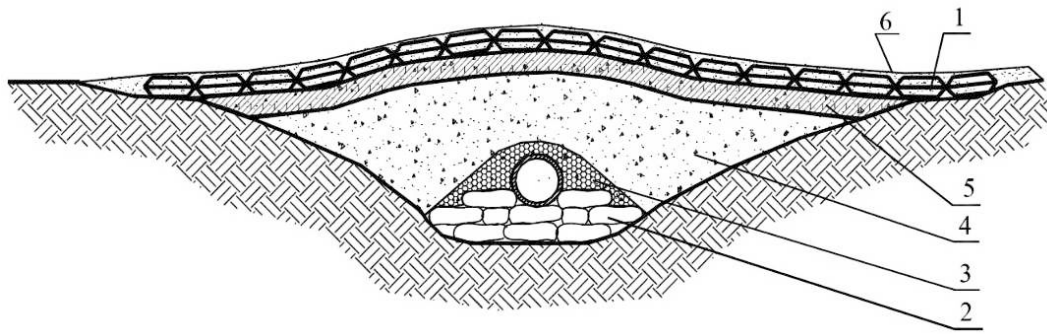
Washout repair diagram using flexible concrete mats:
